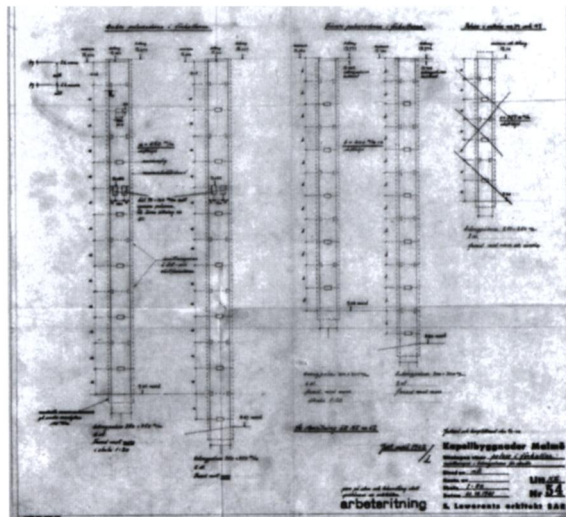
The Chapels of St Gertrud and St Knut, 1941. Architect: Sigurd Lewerentz. Cladding of the columns of the portico. Source: The Swedish Centre for Architecture and Design's collections.
